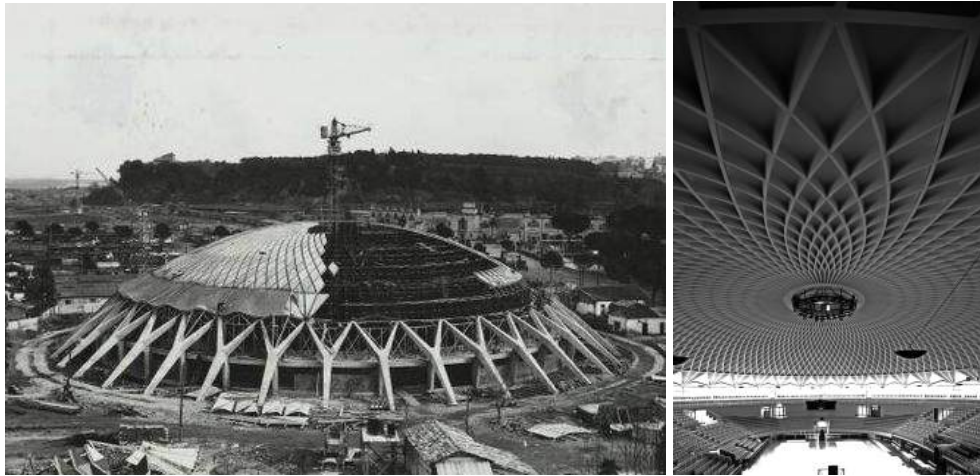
(a) Construction of the shell, [www.impresedilnews.it](http://www.impresedilnews.it) (b) Palazzetto dello Sport
